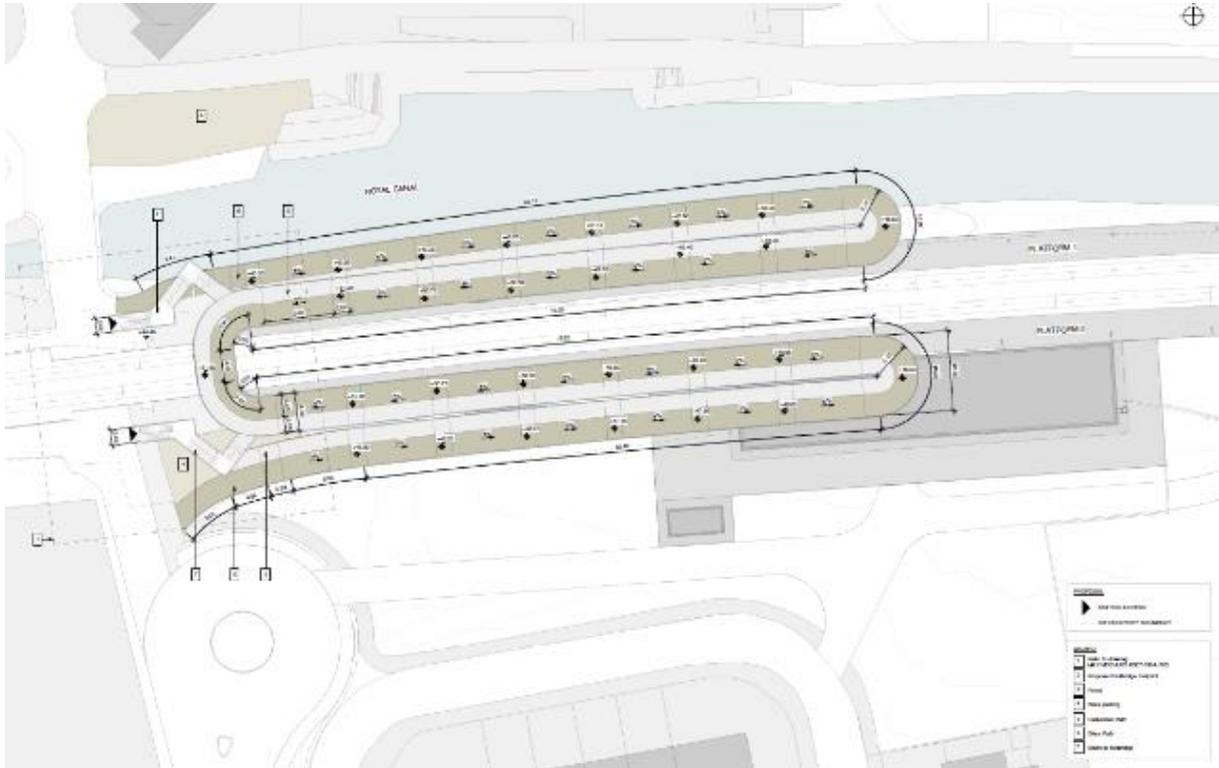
Ashtown Station Pedestrian Bridge Plan
